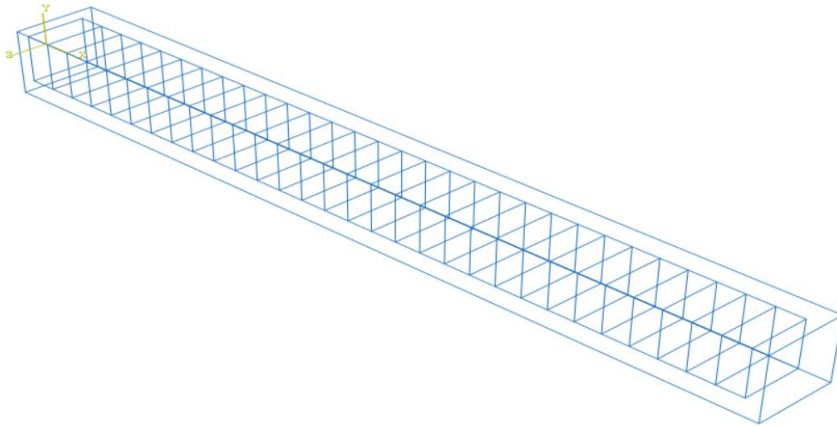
Reinforcement detailing of the numerical modelling (Column-12)
